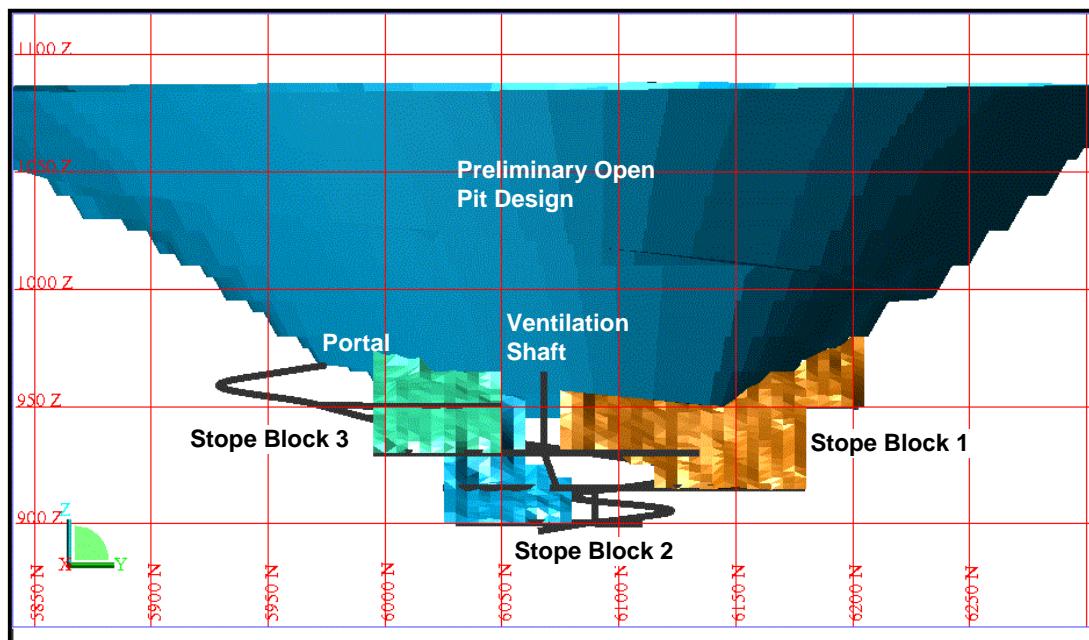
Longitudinal Section Showing Potential Stope Blocks at Trilogy
